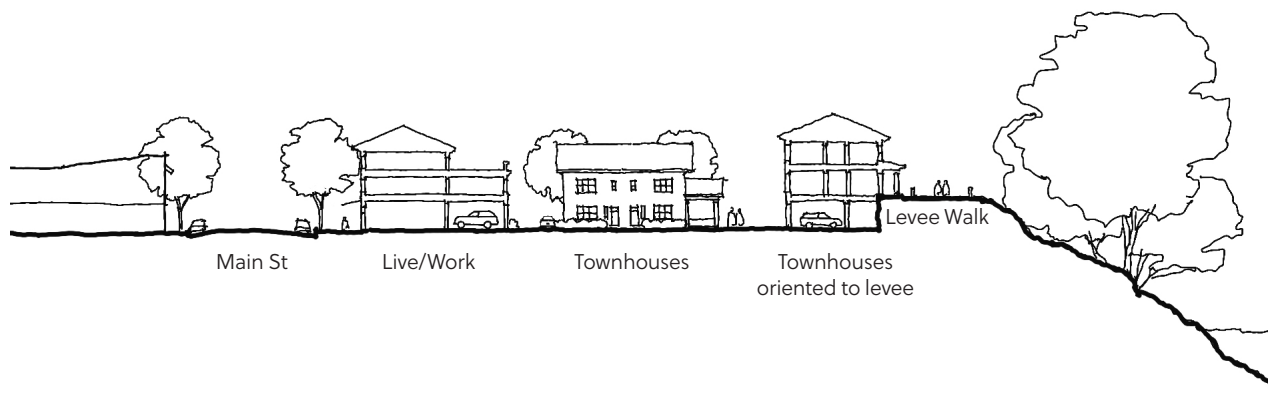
North/south section looking West showing new housing oriented to the levee walk and River
